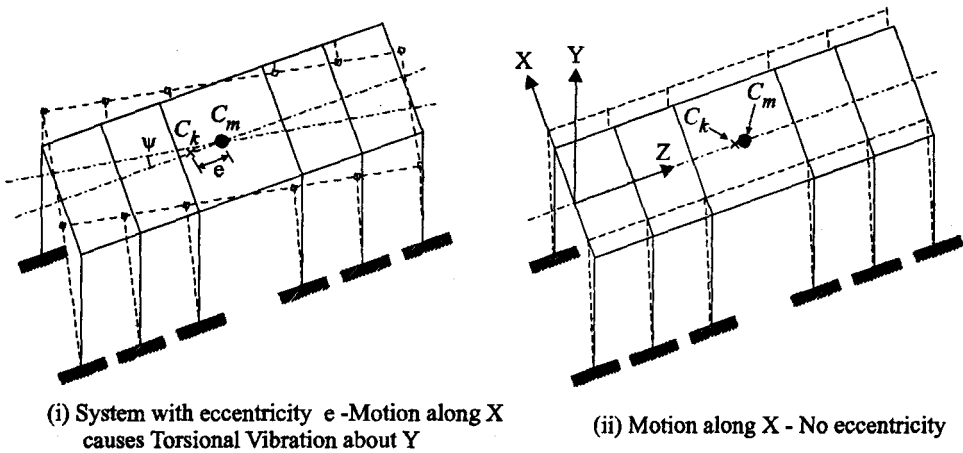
Lateral Vibration of a typical frame foundation - Foundation with and without Top Deck Eccentricity
